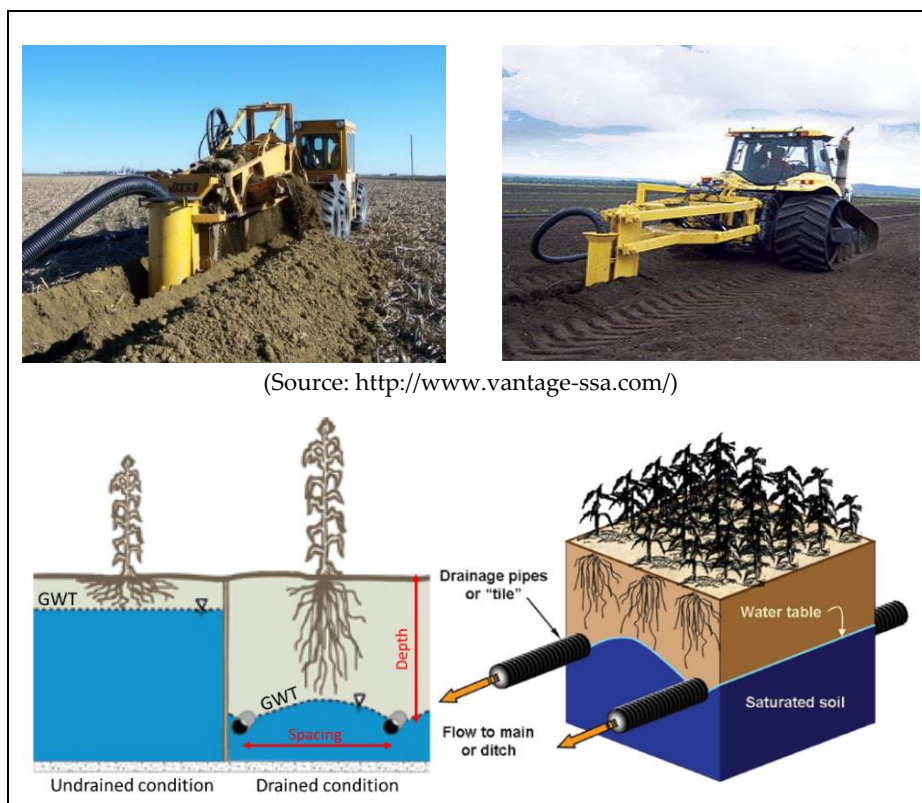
20: Subsurface drainage: upper panels show the installation process and lower panels show the role of subsurface drains in lowering the GWT based on the spacing and depths of inceptor drains, after Blann et al. (2009).
